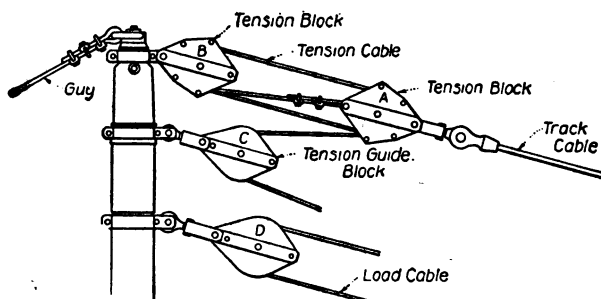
Mast Top and Sheave Assembly Cableway Scraper Excavator.
